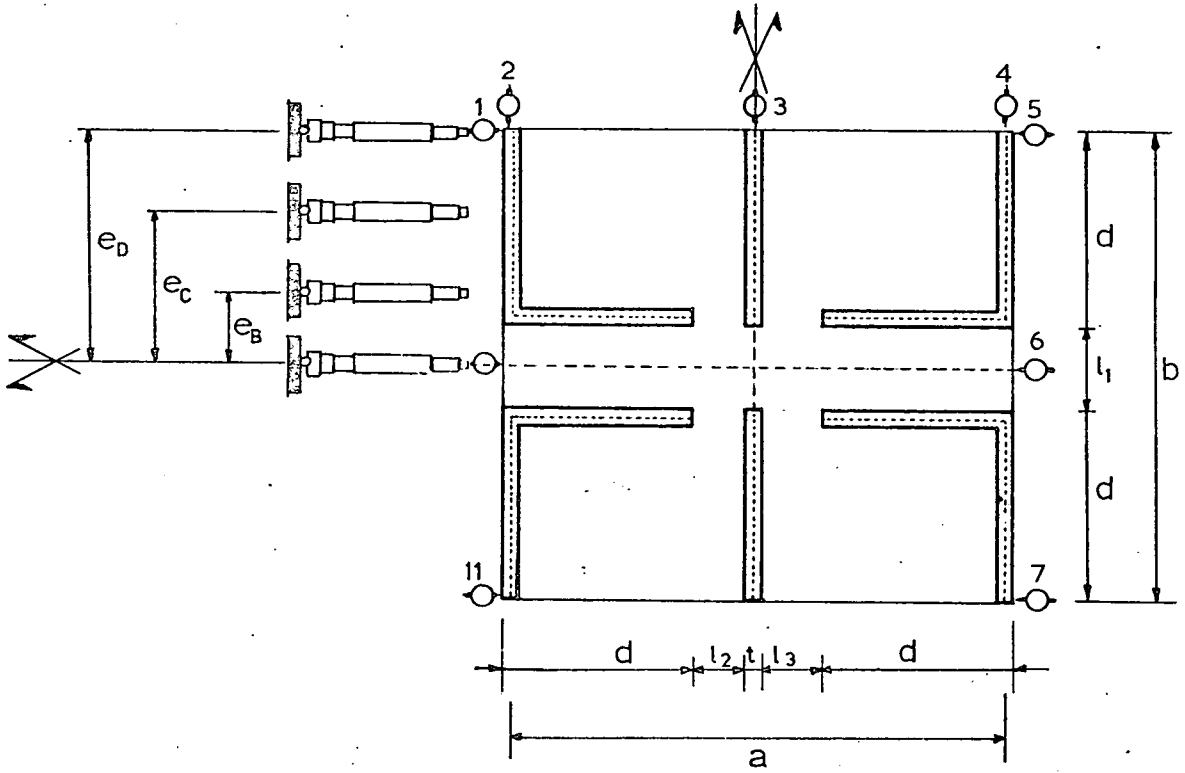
PLAN AND DETAILS OF THE LOADING ARRANGEMENT AND DIAL GAUGES POSITION
